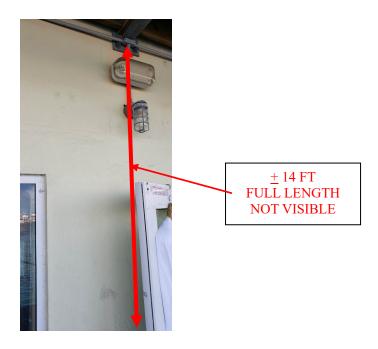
Location 30. Approximately 14 ft long new 16x12 concrete column. See detail 6/S104.
